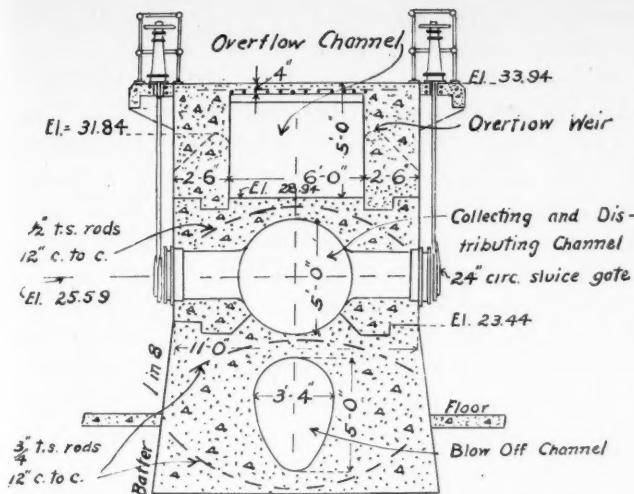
SECTION OF COLLECTING AND DISTRIBUTING WALL
